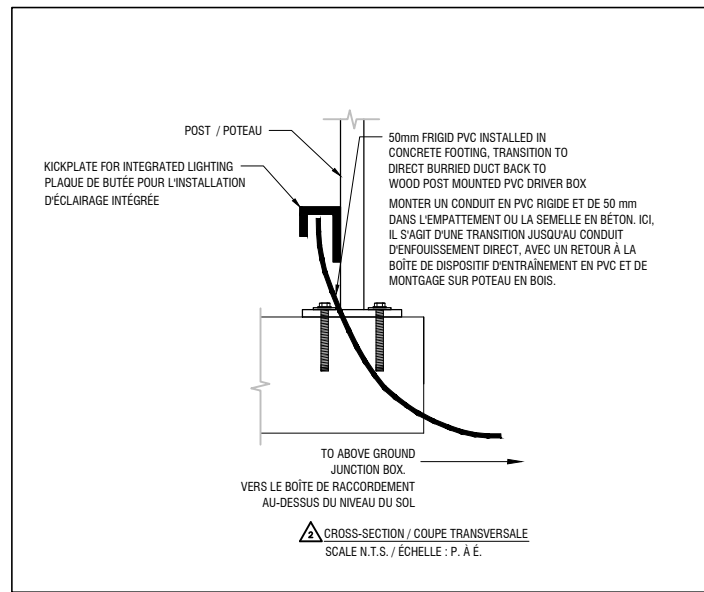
DETAIL A: KICKPLATE LIGHTING ACCESS DETAIL FROM TOP OF STAIRS (TOP TWO HANDRAILS FED FROM POST MOUNTED DRIVER BOX)
